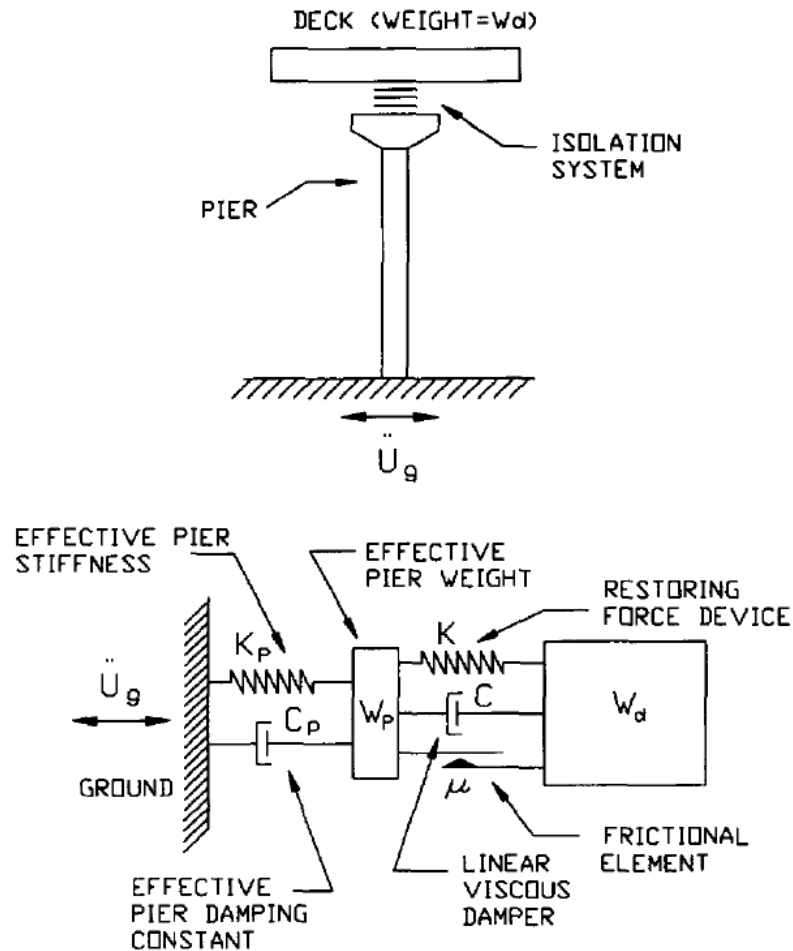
Pier-deck model (Tsopeles et al., 1996)
